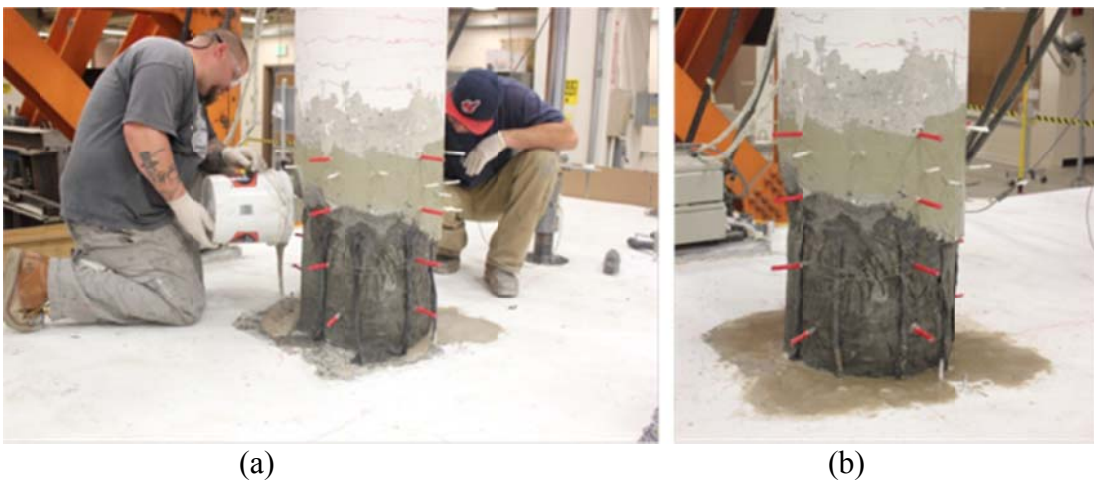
Partially fixing the column-bent cap interface using a sand-epoxy mixture; (b) overview of the partial repaired column after installing all injection ports, CFRP reinforcing bars, and patching the damaged parts in column core and at the column-bent cap interface
